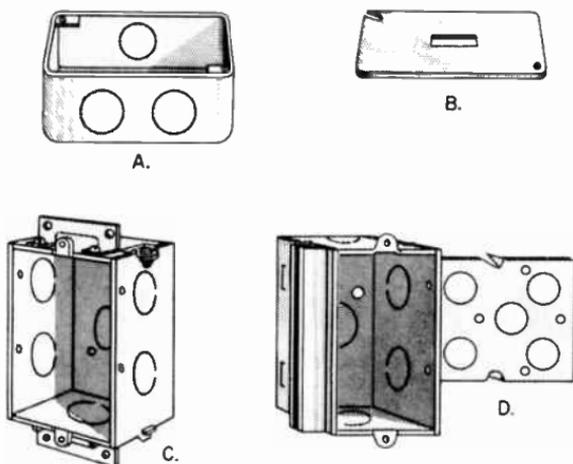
"Switch boxes" used to enclose switches and convenience outlets.
